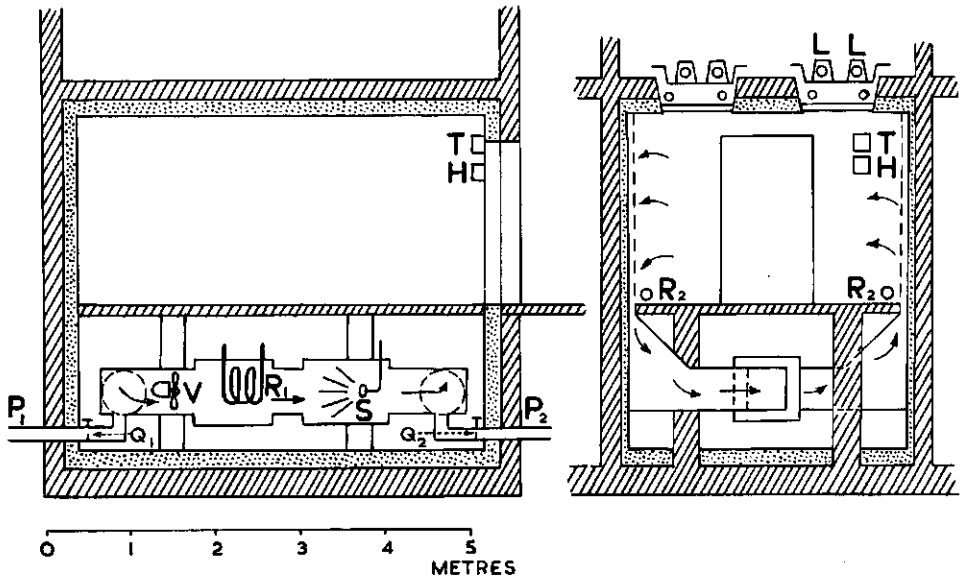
LONGITUDINAL SECTION AND CROSS SECTION OF A COLD ROOM
